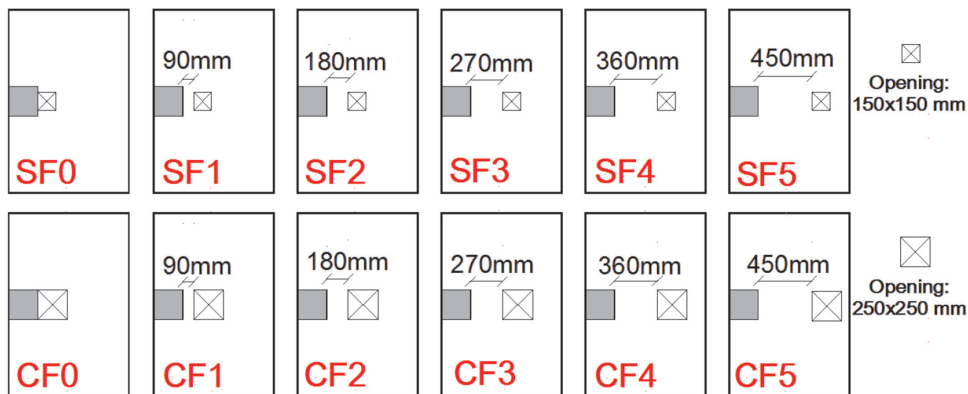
Schematic drawing of edge slabs with openings. (Note: 1 mm = 0.0394 in.)
